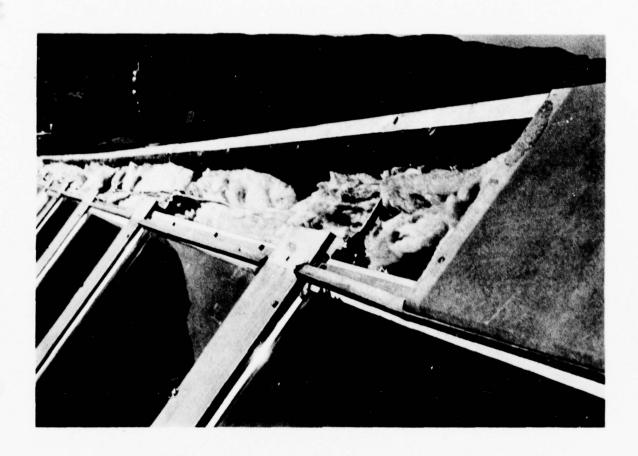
Roof Array Bleed Air Line (Looking West)
